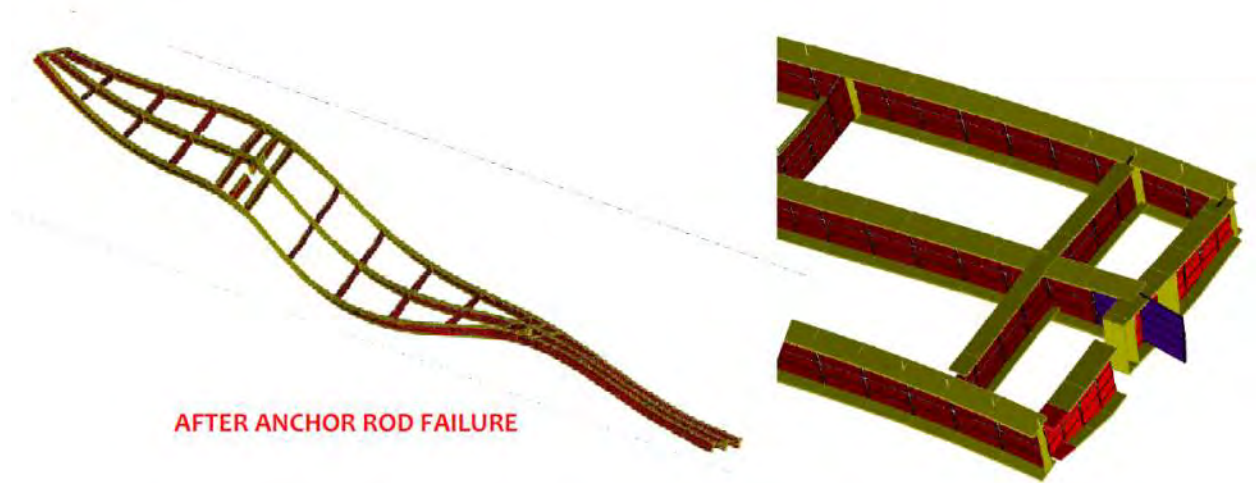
Deformed Structure at 4.2xHL93, after removal of the anchor rod (Deck not shown for clarity).
